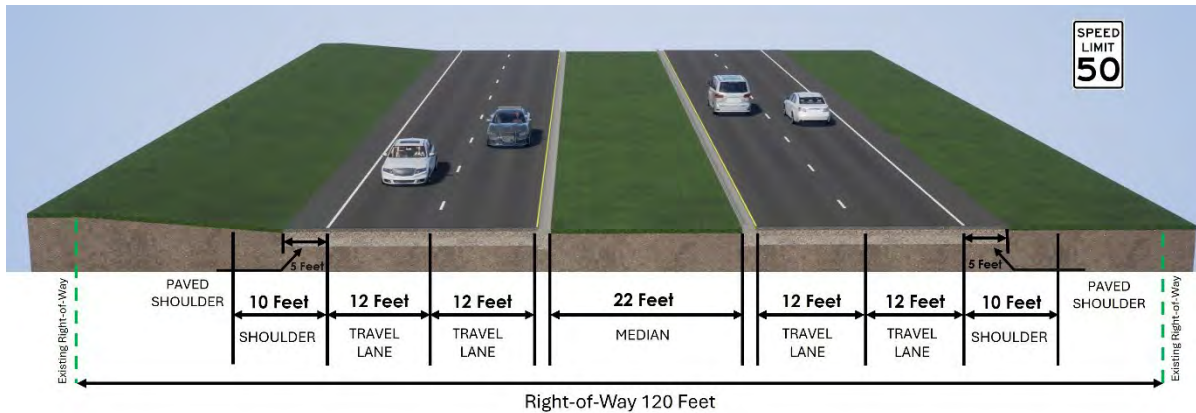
Existing Roadway Typical Section: North of DeSoto Bridge
